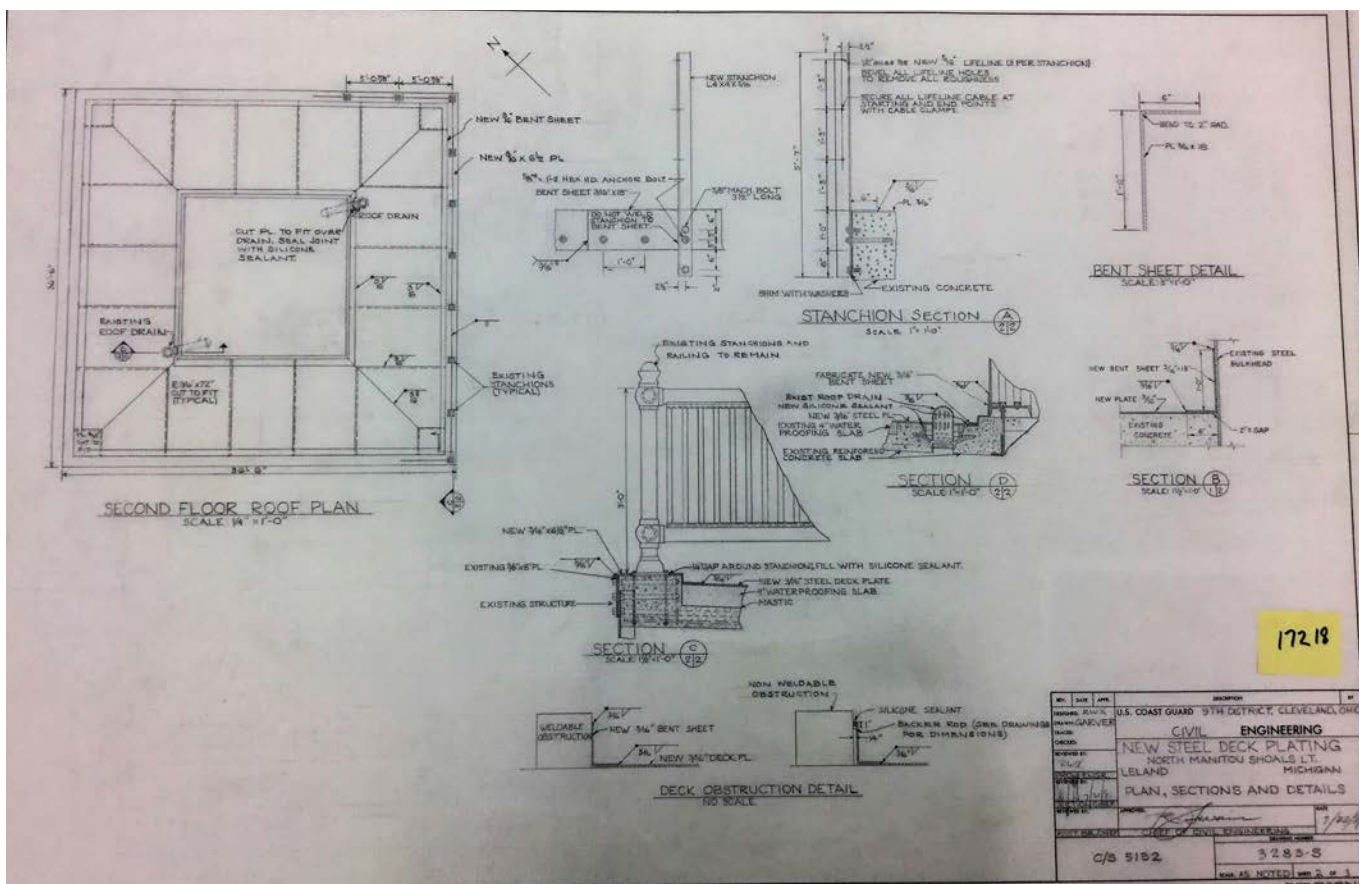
B-74: 1980s drawings for installation of steel plates on the pier and watch decks.
